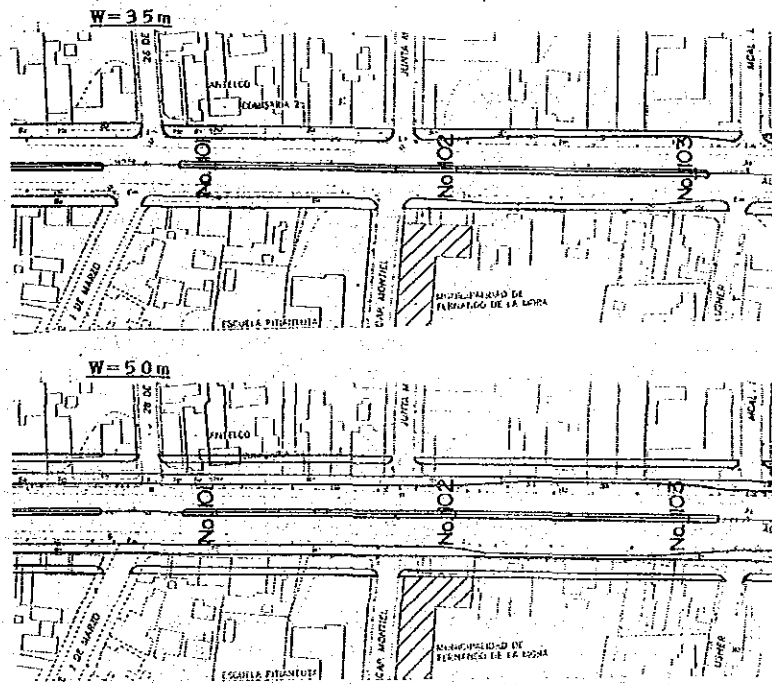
PLAN OF MCAL. ESTIGARRIBIA ROAD (SECTION NO. 101+00 AND 102+00)
